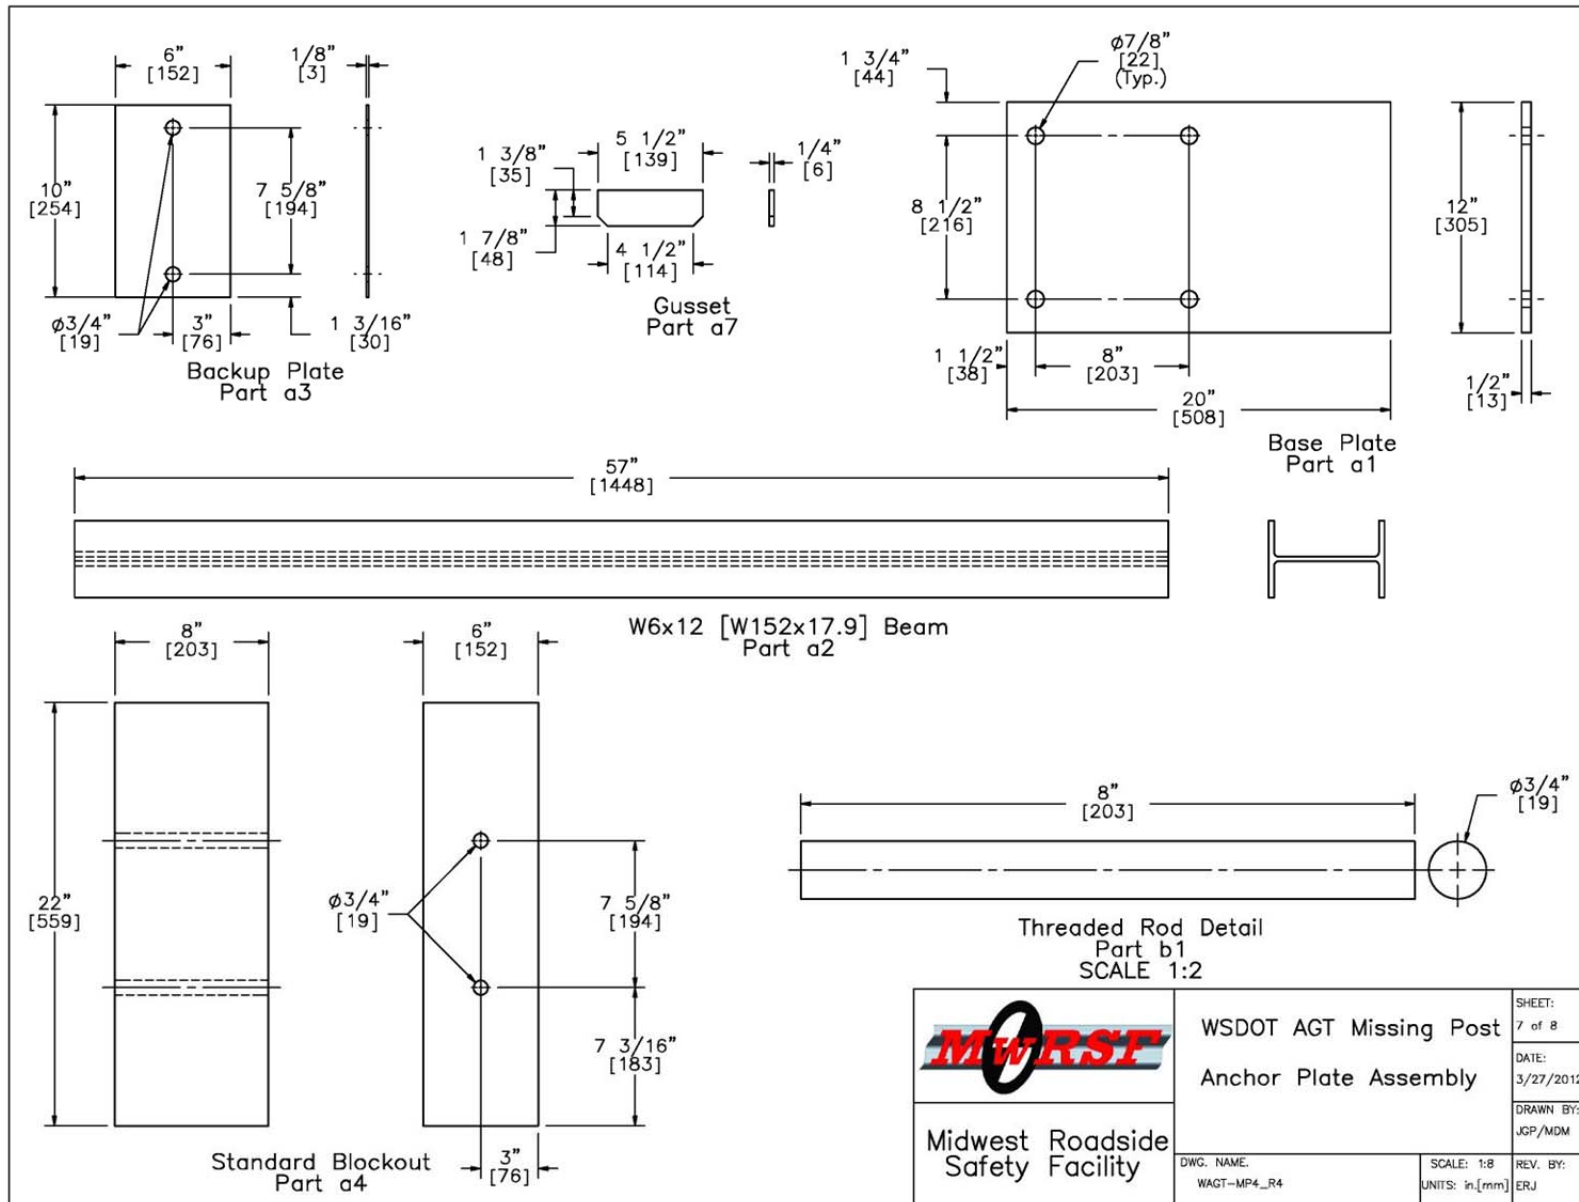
WAGTMP Bogie Testing Anchor Plate Assembly
